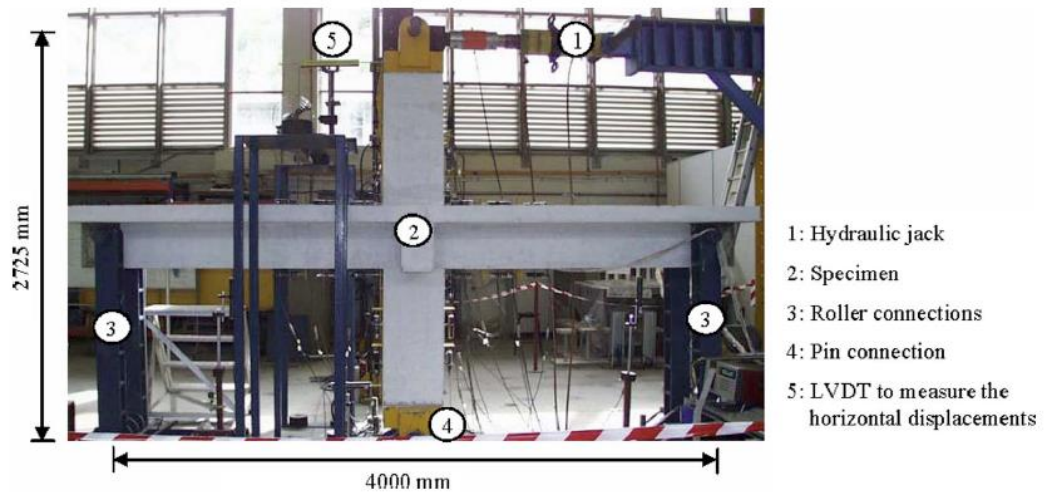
Test setup for interior beam-column connection (Li et al., 2009)
